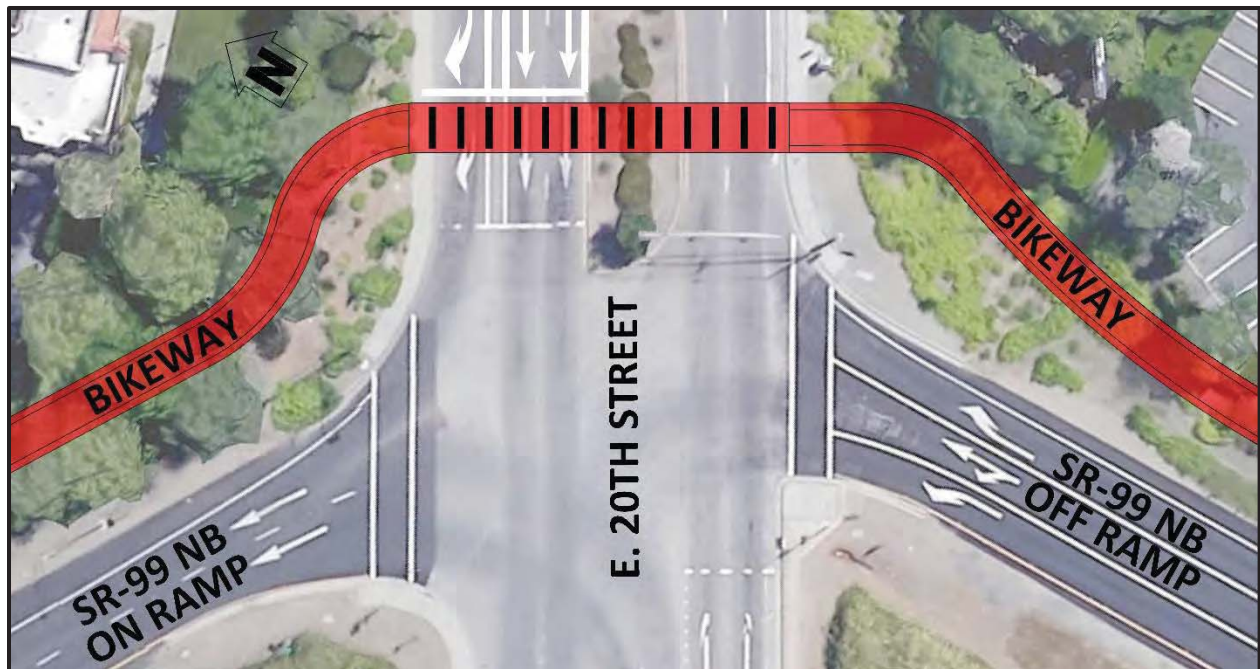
PROPOSED AT-GRADE CROSSING ALTERNATIVE 1 AT 20TH STREET AND SR-99 RAMPS
